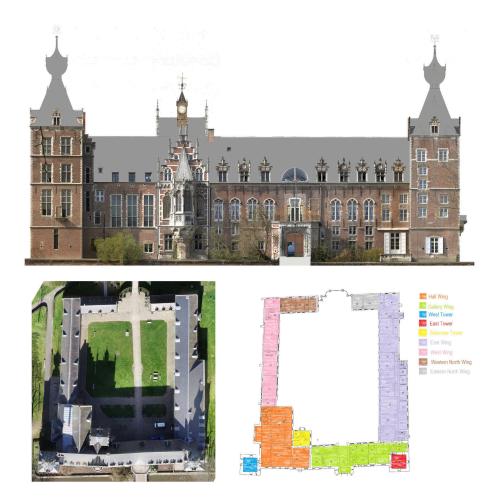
South facade of Arenberg Castle, above [image: KU Leuven / Koufopoulos et al. 2021]; aerial view of the main building, left [image: KU Leuven / Koufopoulos et al. 2021]; floor plan of the ground floor with color labeling of different structural units, right. [Image: atlas plan, KU Leuven, Technical Services]
